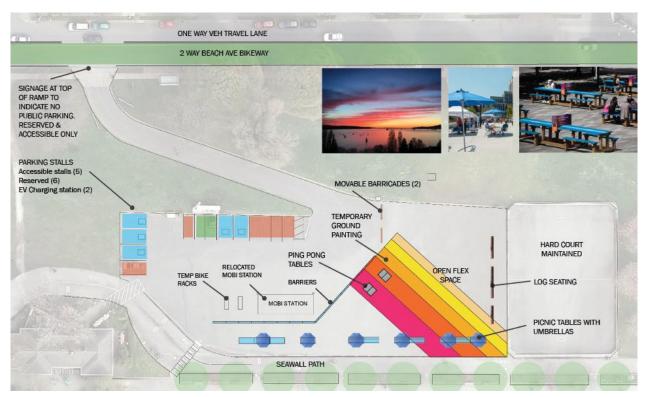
Layout Plan of the Sunset Beach Pop-Up Plaza
